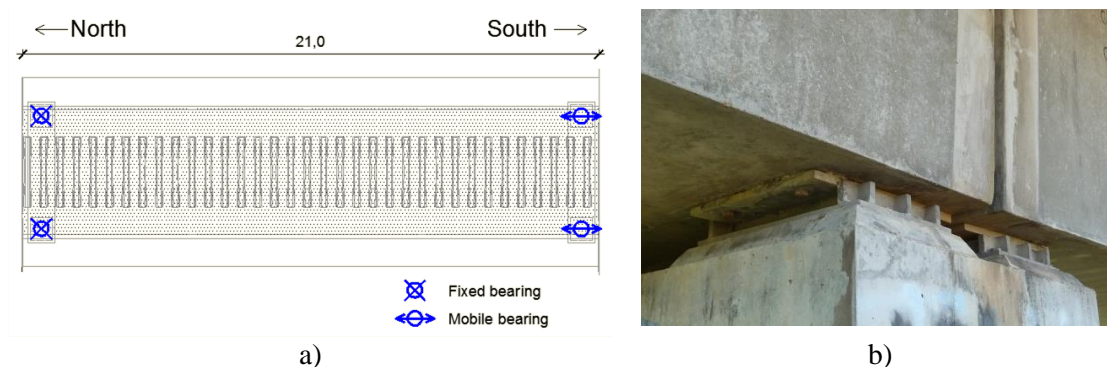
Bearings system: a) schematic representation; b) generic view of guided bearing
